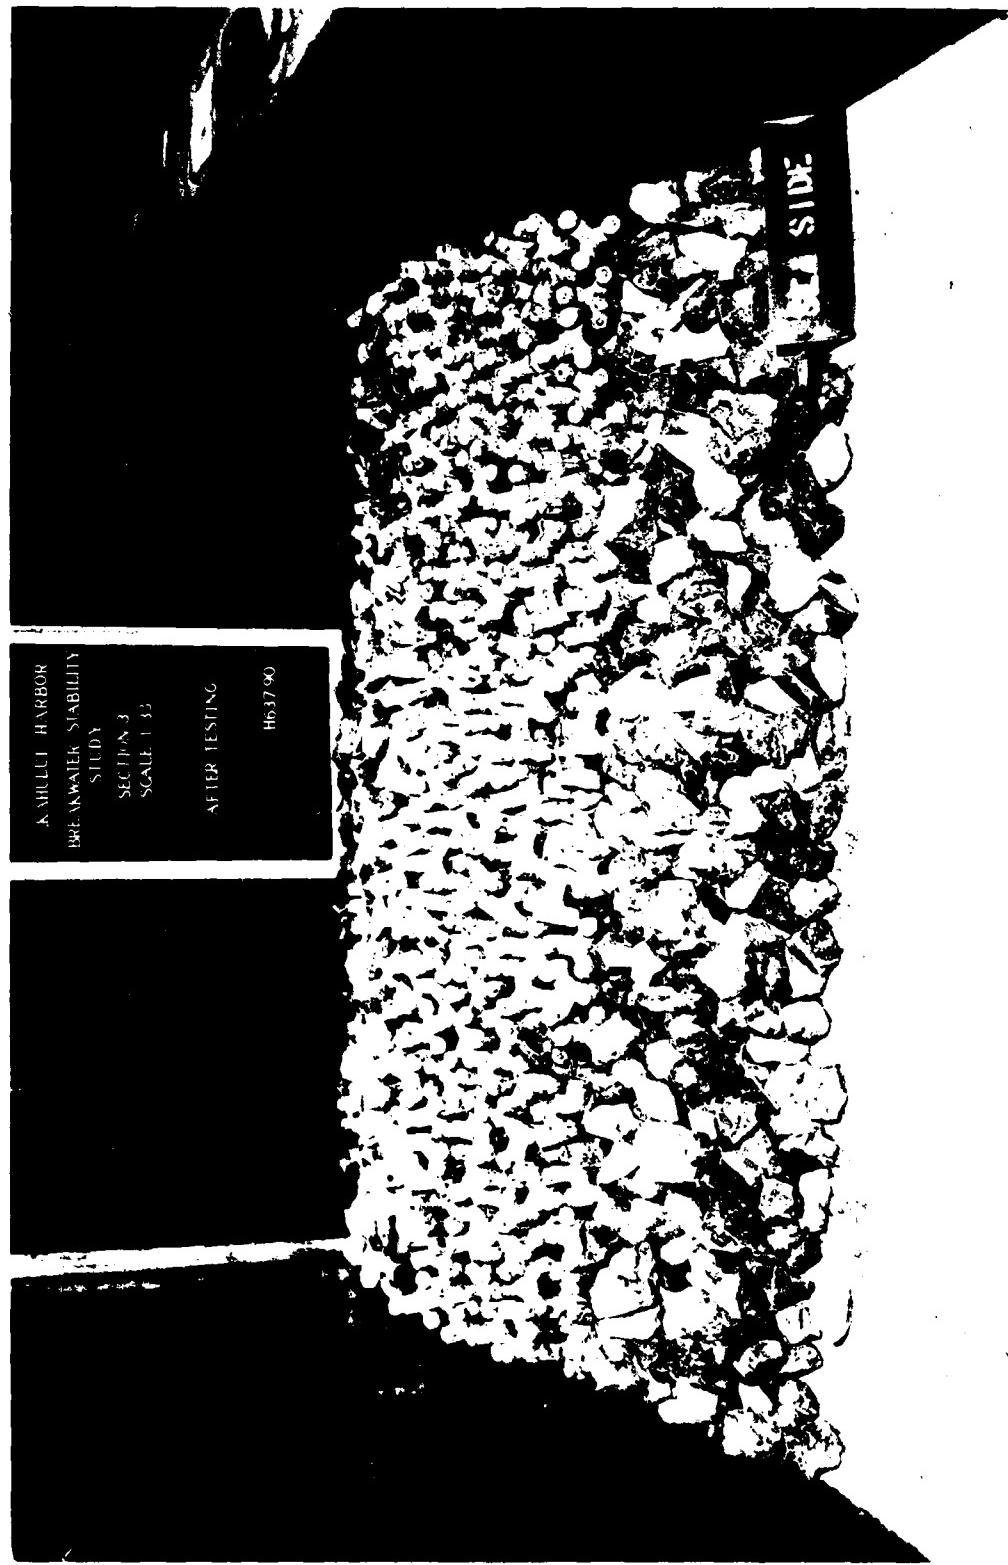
Sea-side view of Plan 2 after testing, 2nd test
